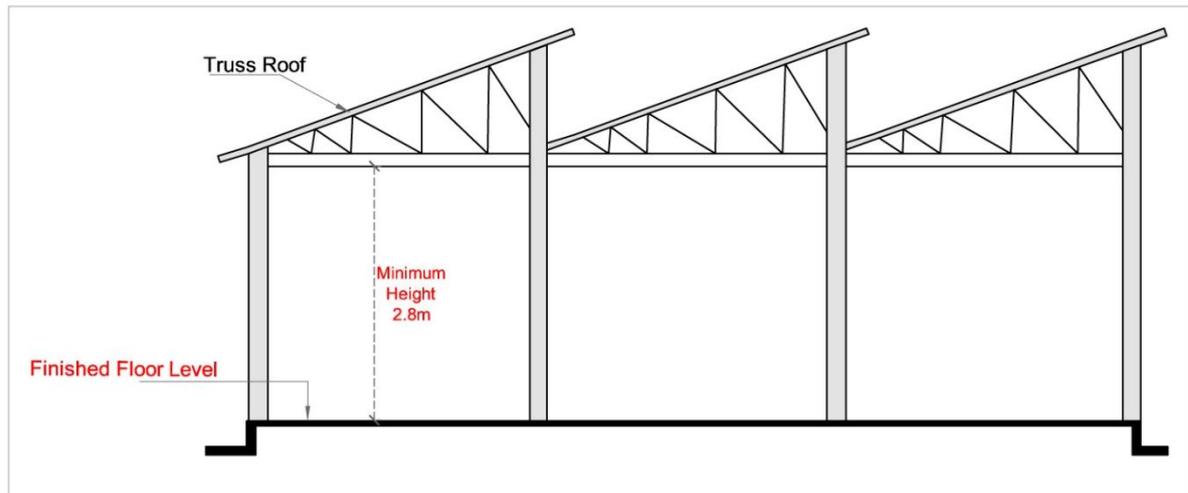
Minimum Clear Height for Trussed Roof
